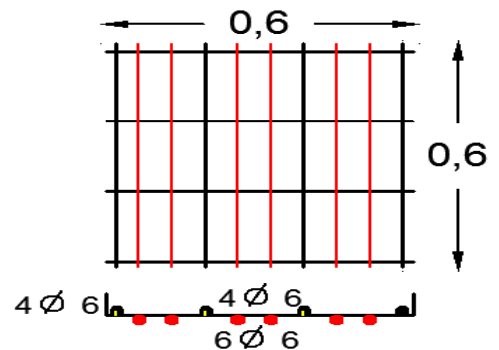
Slab with Reinforcement 7 Ø 6 mm steel bars in both Directions
